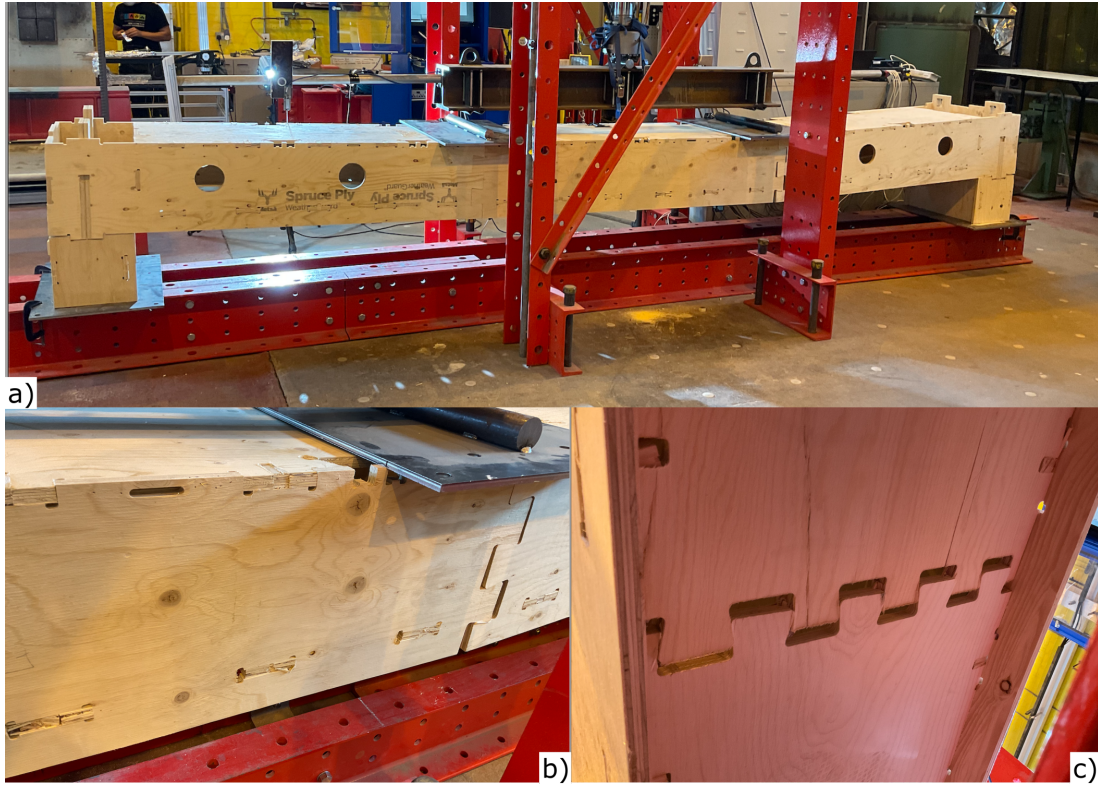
Typical failure of the beam specimens: a) overview of the specimen at failure, b) detail of the stitched joints/ side dovetail joints. and c) detail of the bottom flange dovetail joint.
